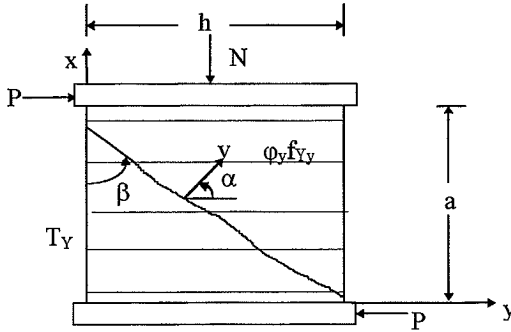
Failure mechanism of a shear wall with horizontal stirrups subjected to transverse loading
